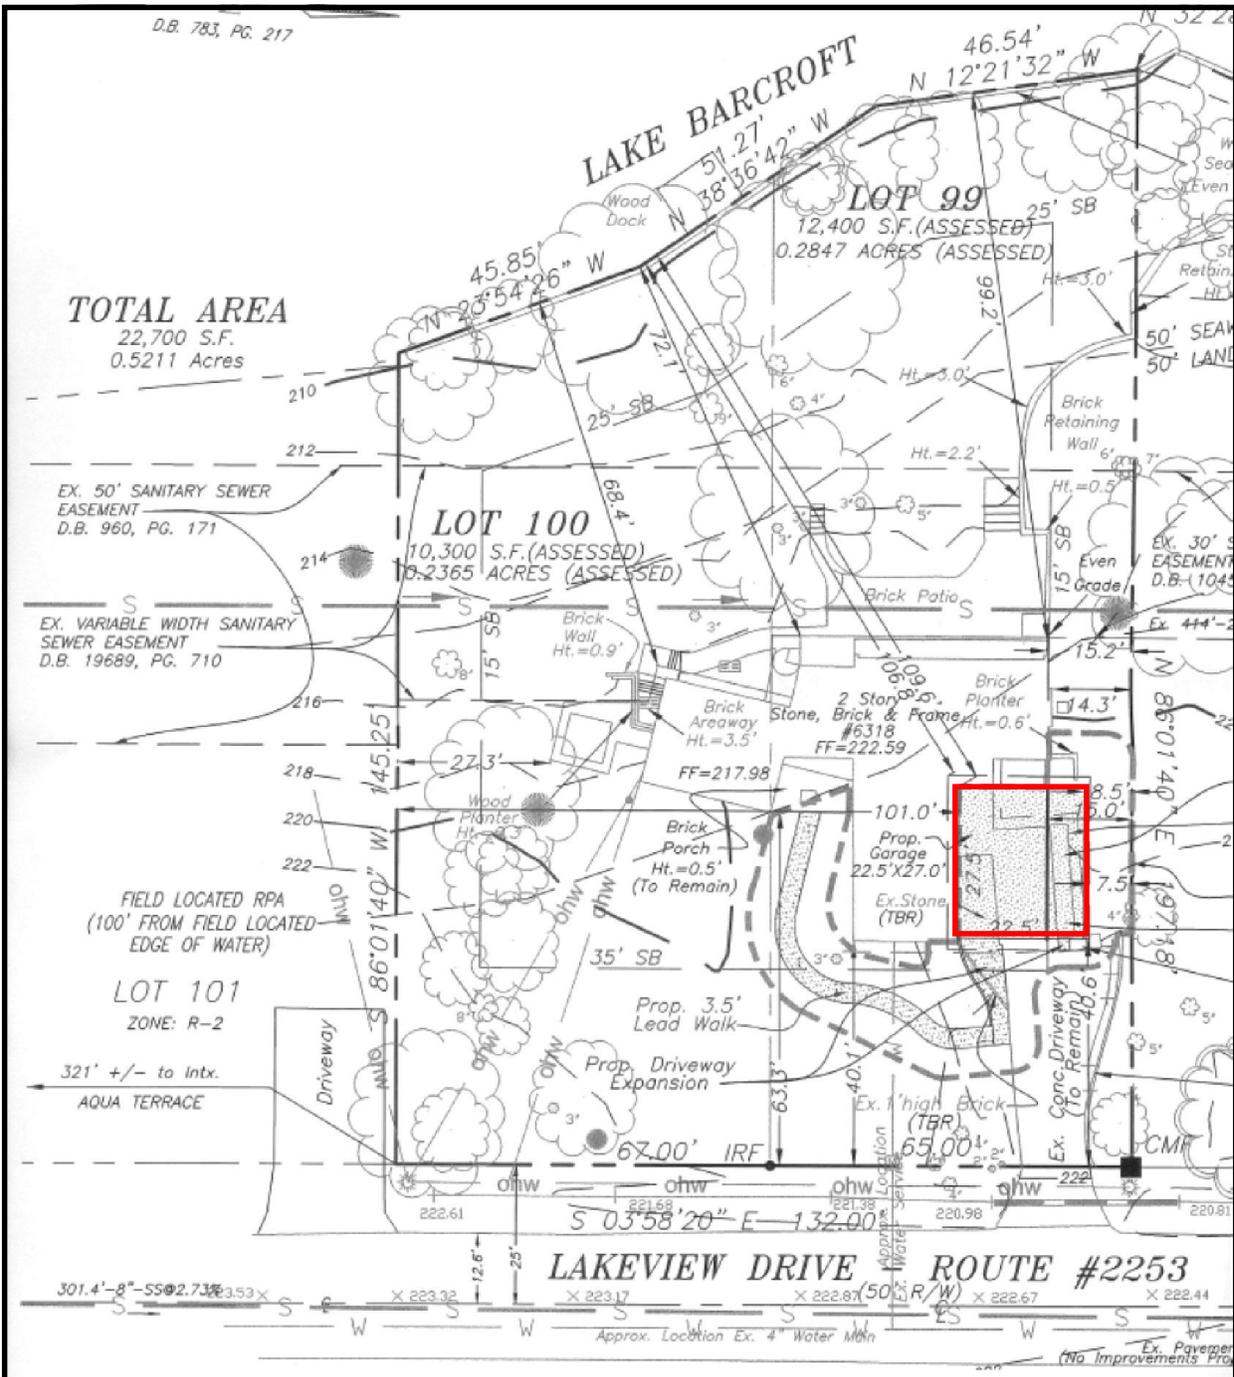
Special Permit Plat (partial). The proposed garage addition is outlined in red.
